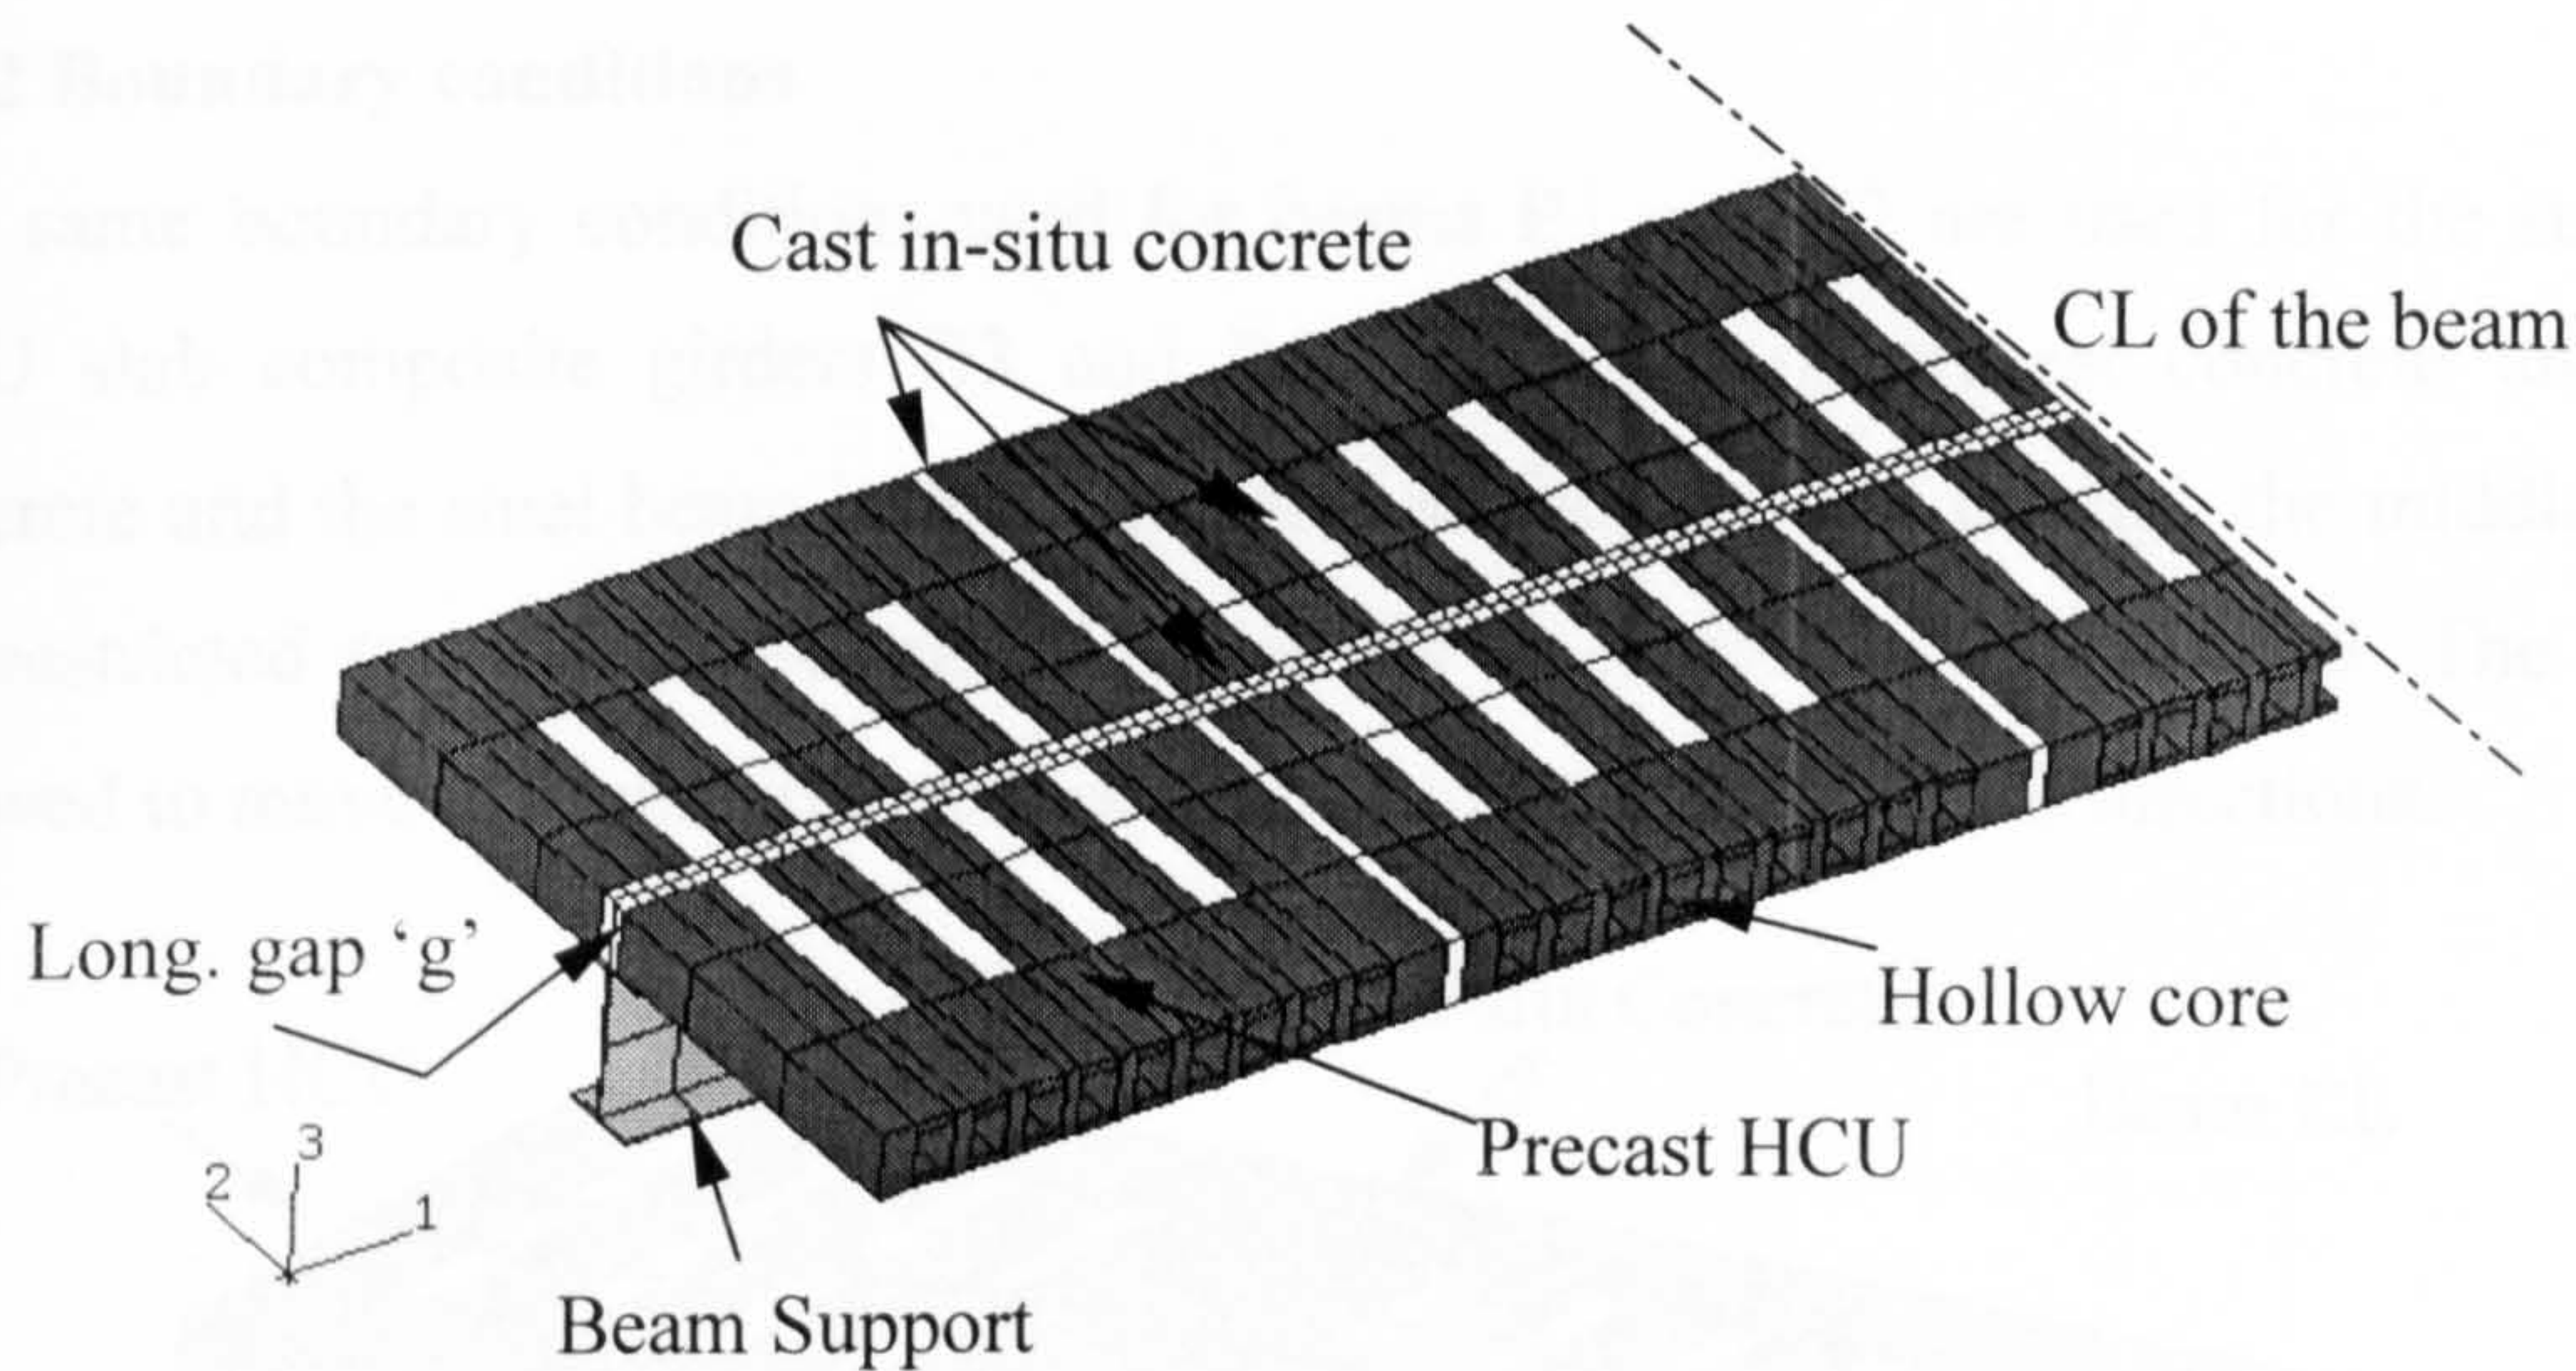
e General Layout of steel-precast HCU slab composite girders B3 and B4
